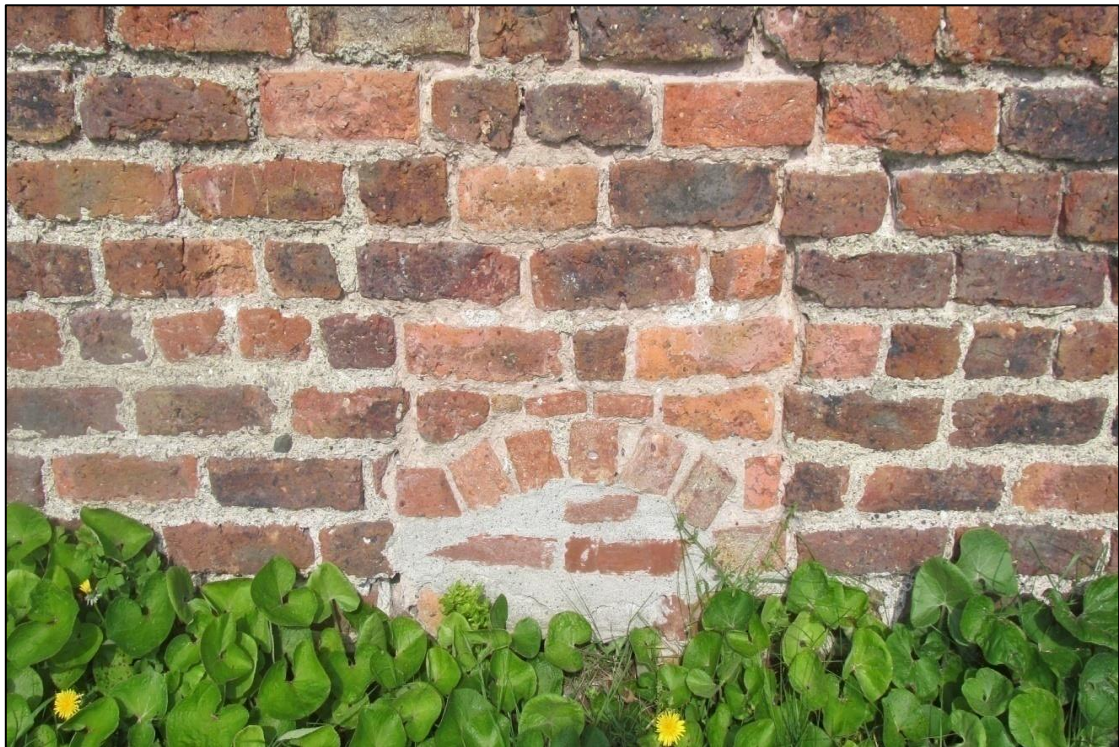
One of many later repairs to extant garden wall (AH1)
